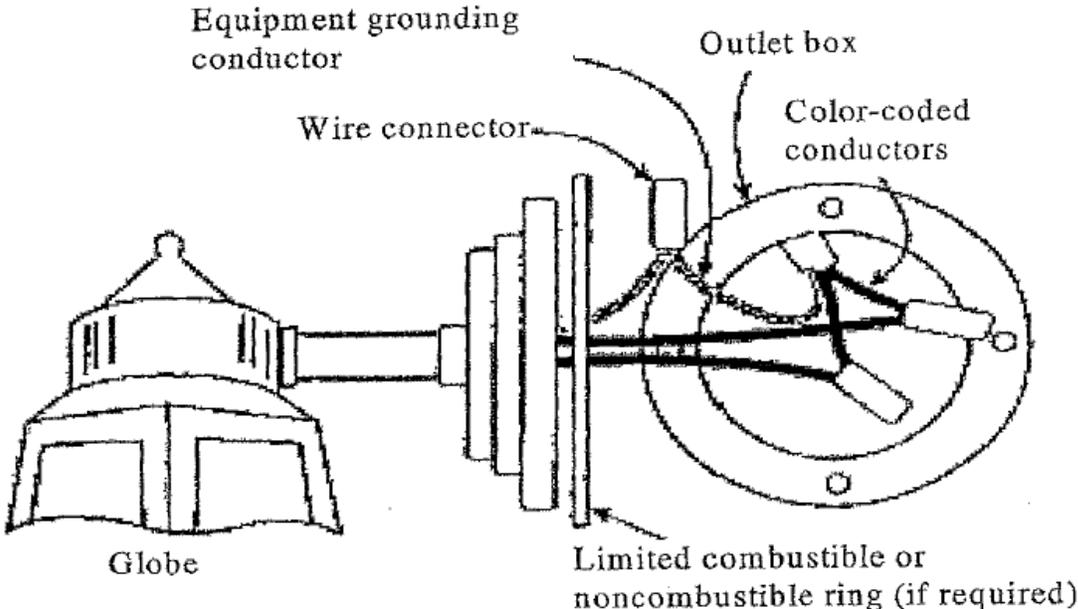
Typical Installation of Surface-Mounted Exterior Lighting Fixture.
